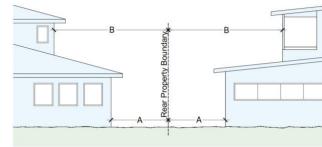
Rear setbacks - Multi dwelling housing, attached dwellings and semi-detached dwellings
